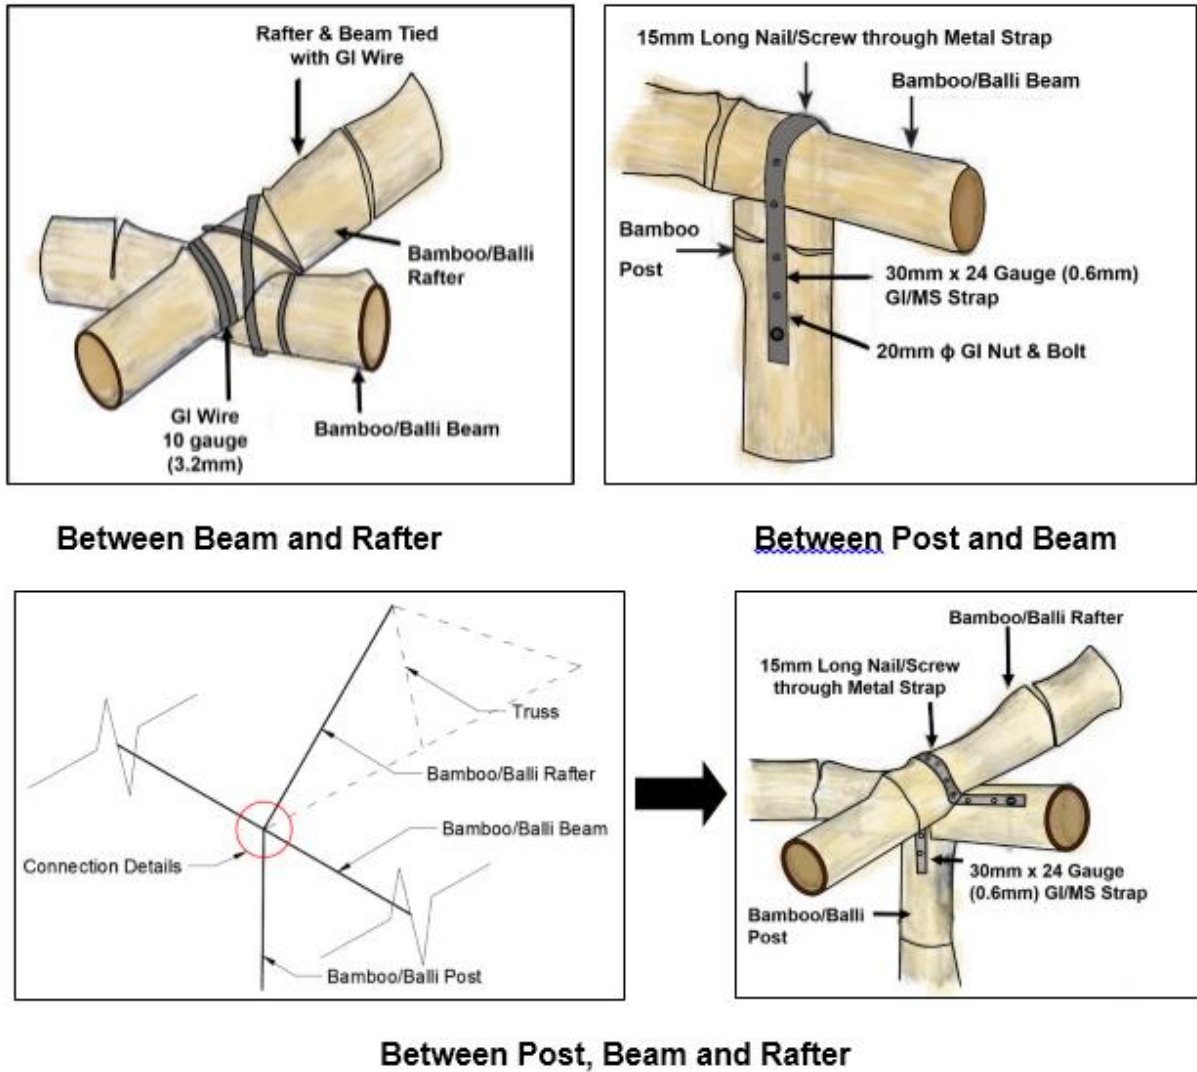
CONNECTION OF ROOF FRAME WITH WOODEN WALL FRAME
